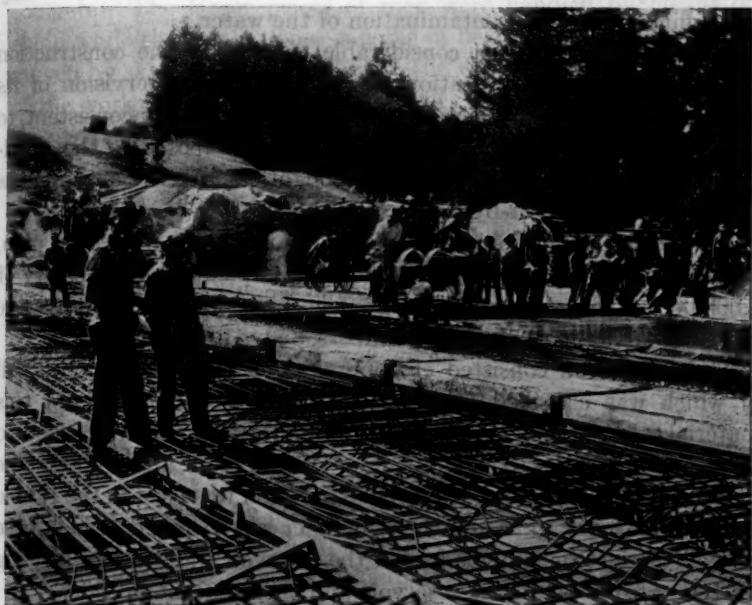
CONCRETING ROOF SLAB OF COVERED CONCRETE RESERVOIR AT EUGENE, OREGON
